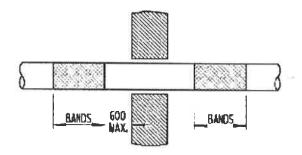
Colour identification at bulkheads, wall penetrations and floors
